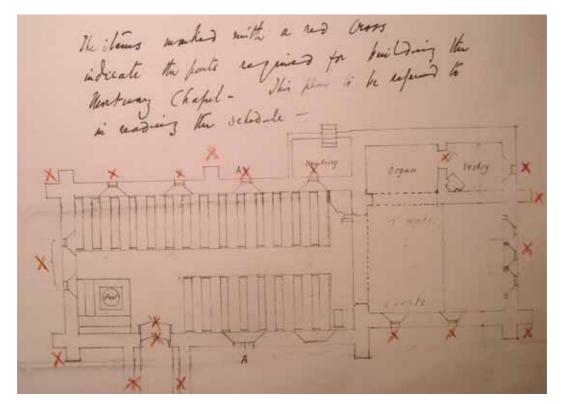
Plan of St James' Church, showing elements to be transferred to the new church (marked with red crosses)
